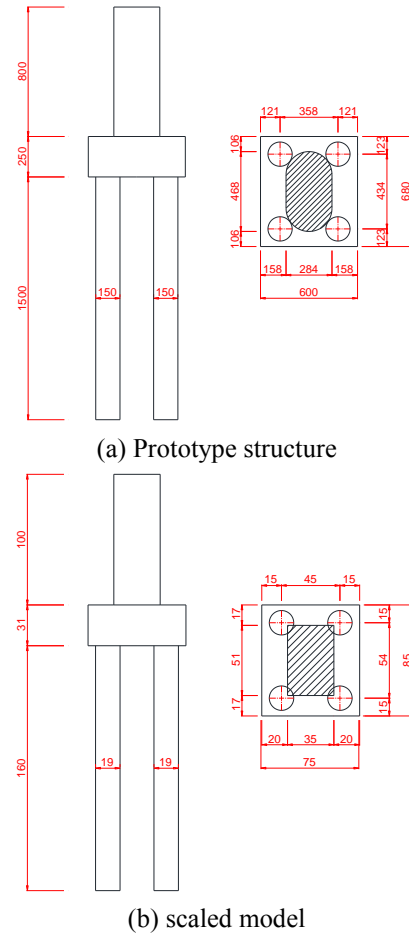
Dimensions of the bridge pier with pile foundation (unit: cm)
